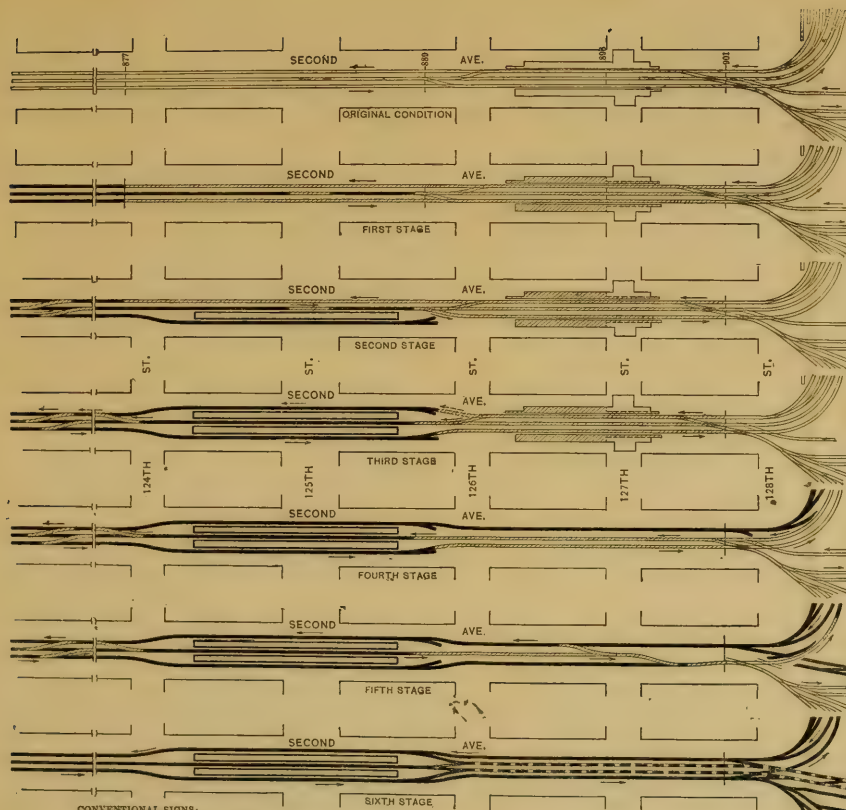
SECOND AVENUE LINE, NORTH OF 125TH STREET.
